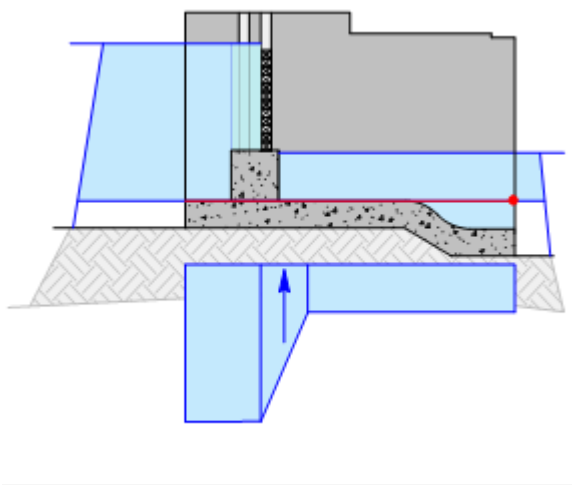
Uplift Pressure at the Concrete-Concrete Interface
